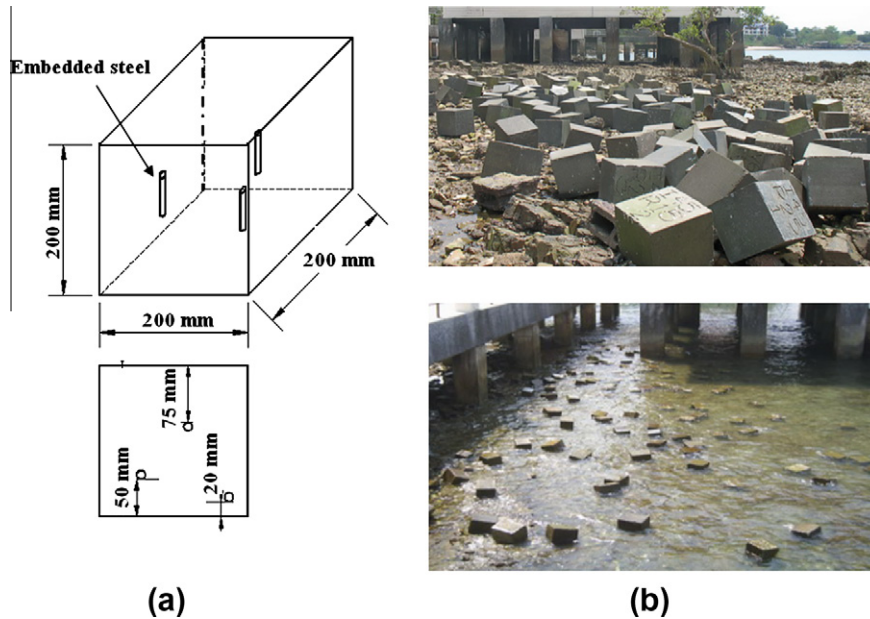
(a) Details of embedded steel bars in concrete, (b) concrete specimens at the tidal zone of sea water.
